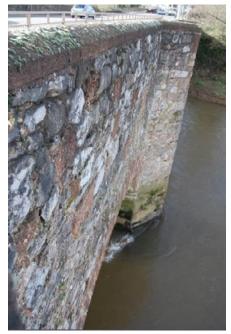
Cutwater Type A, upstream elevation (looking SW)
